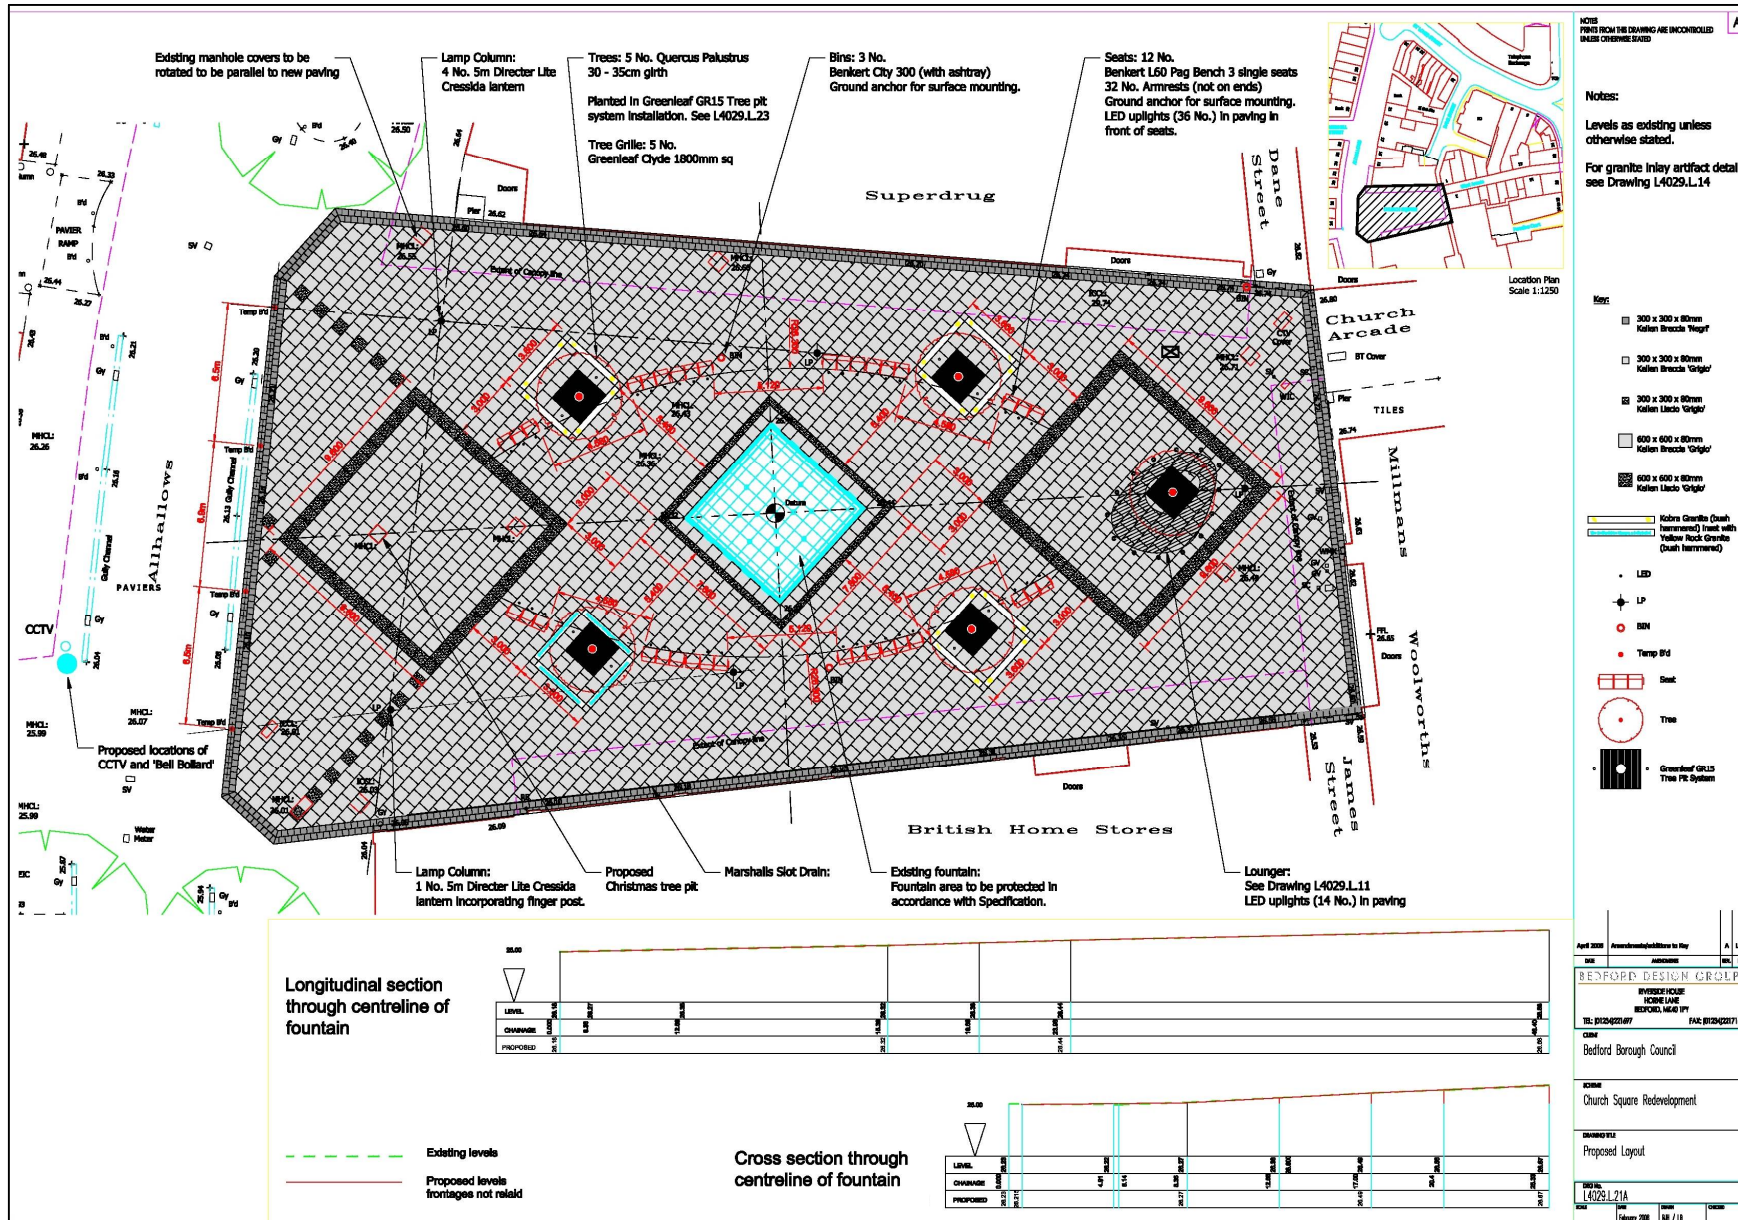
Site layout as proposed. (Drawing by Bedford Design Group. Not to scale)
